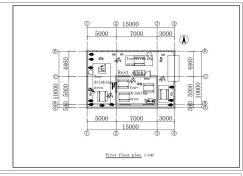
Red Dangerous Building Renovation and Floor Plan (Author's Self Drawing)
